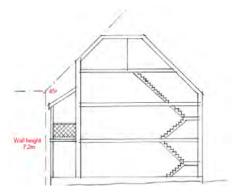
Building envelope – 7.2m wall height – three storeys, to a scale compatible with grander terraces or mansions, or when the wall height is used as a parapet. *Source: LDCP 2013
